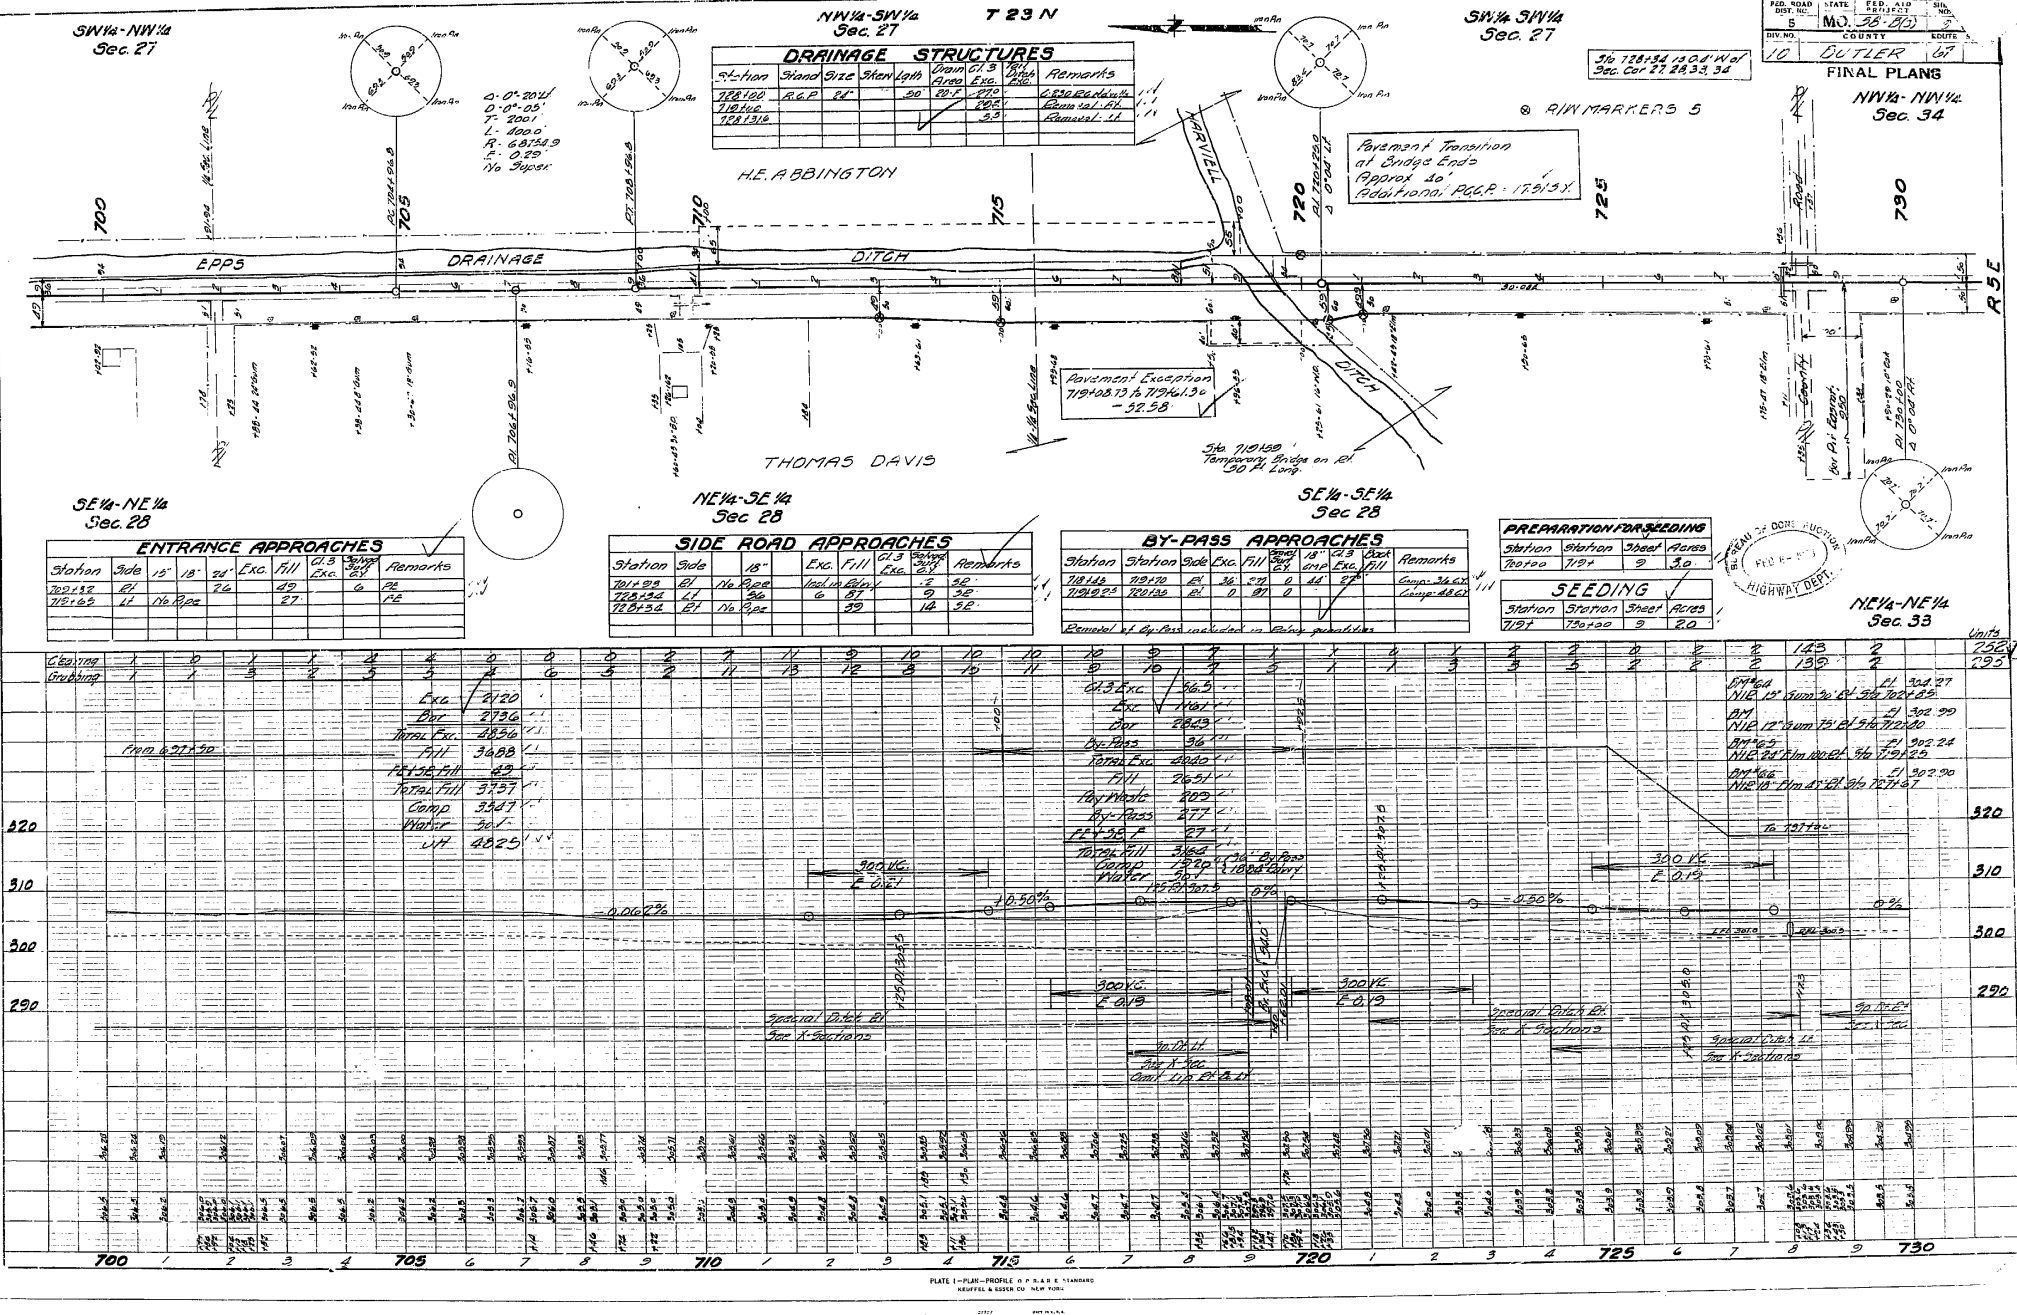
PLAN PROFILE OF ROAD & STANDARD
